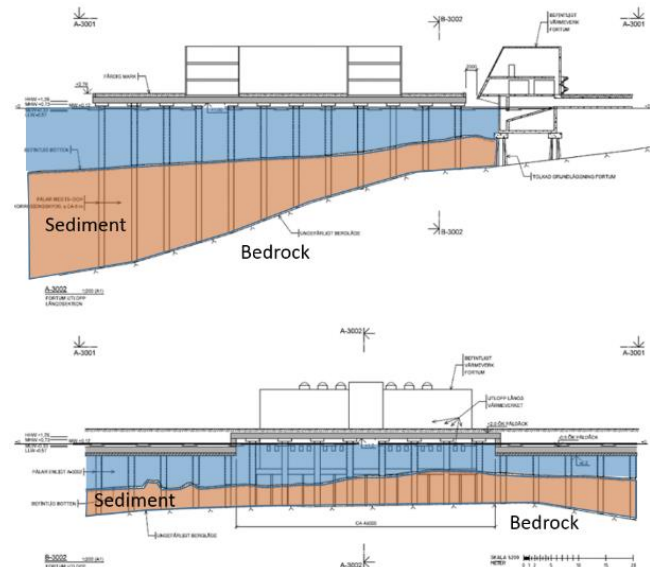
Piled deck structure in front of the heating power plant outlet structure. Top: North-South cross section with the outlet structure on the right. Bottom: East-West cross section viewing towards the Southern quay with the 20 outlet openings visible just below the deck slab.
